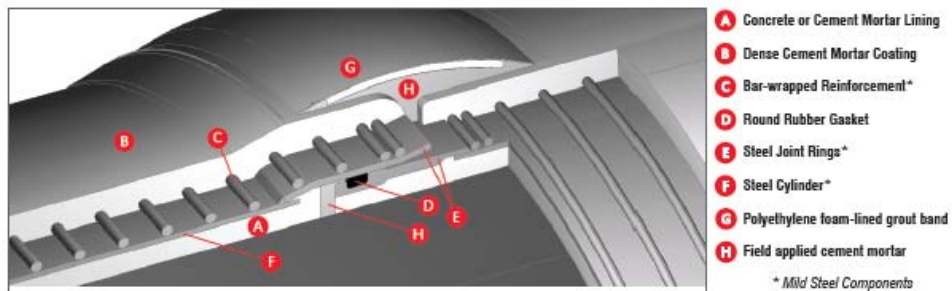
Typical C303 Pipe Joint Detail Cut Away
